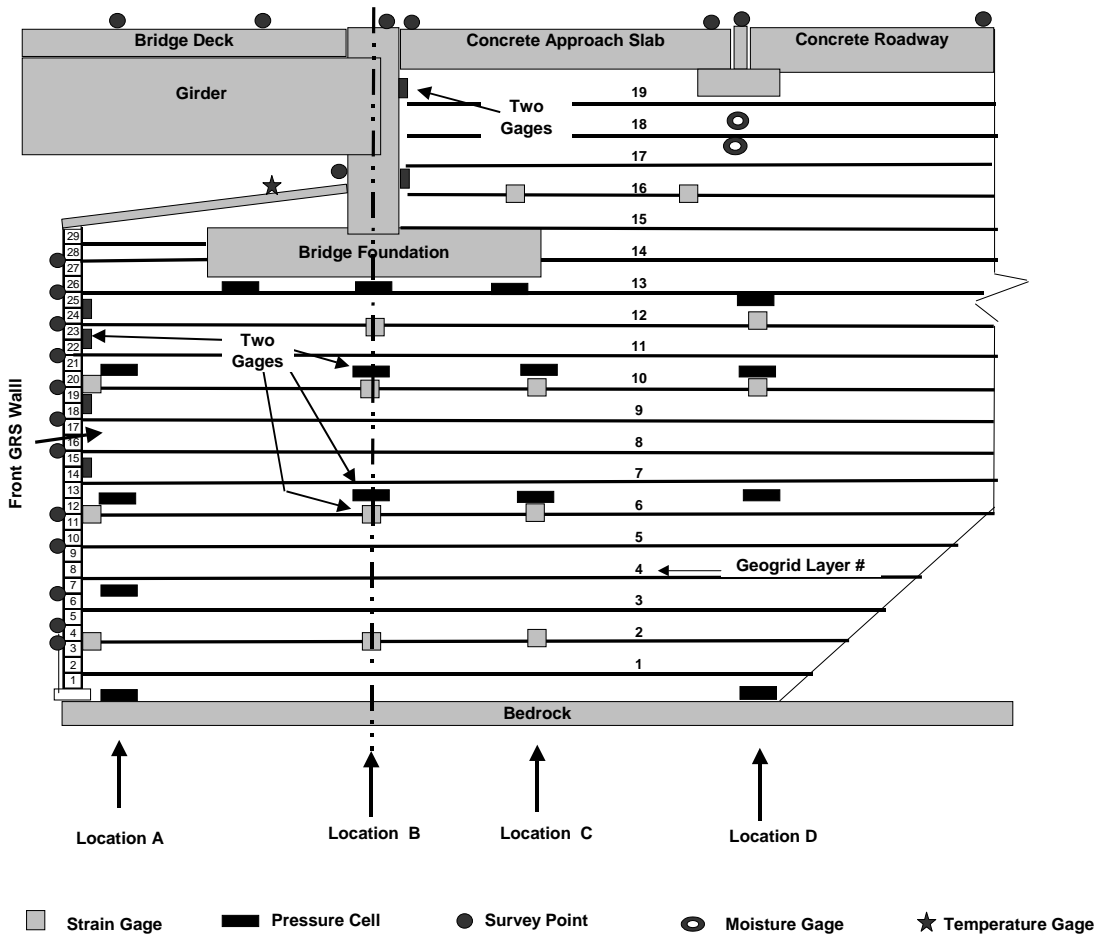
Instrumentation Layout of Section 800 of the Founders/Meadows Bridge Approaches.
